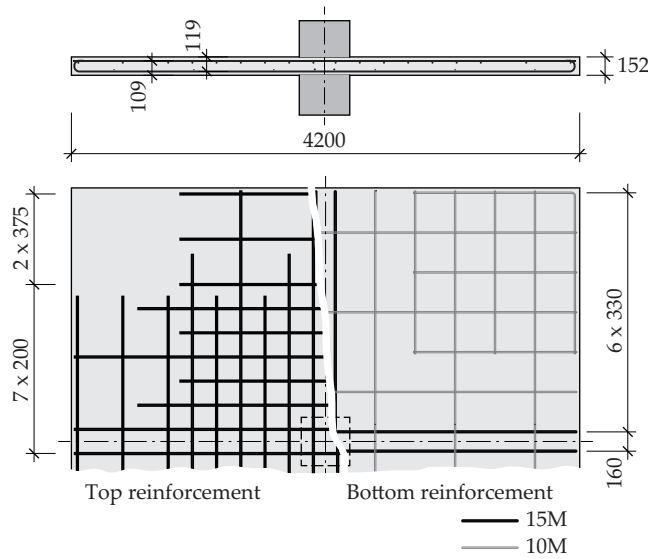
Reinforcement layout of the specimen (dimensions in mm)
